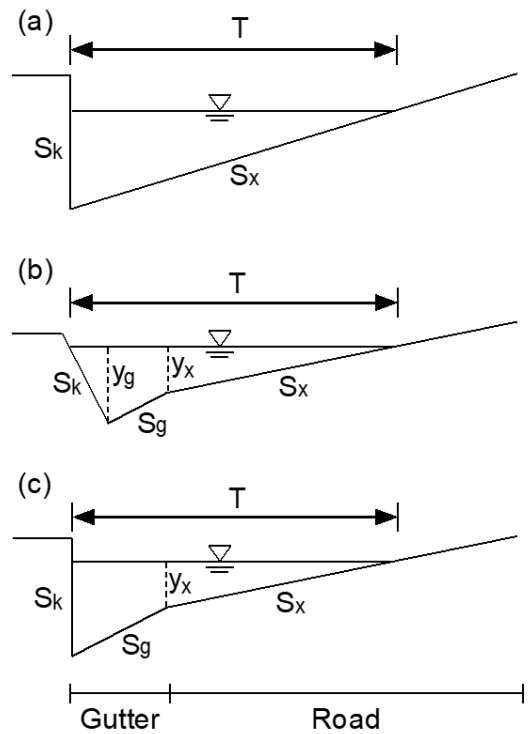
Configuration of gutter sections: (a) uniform section, (b) V-shape section, and (c) composite section.
